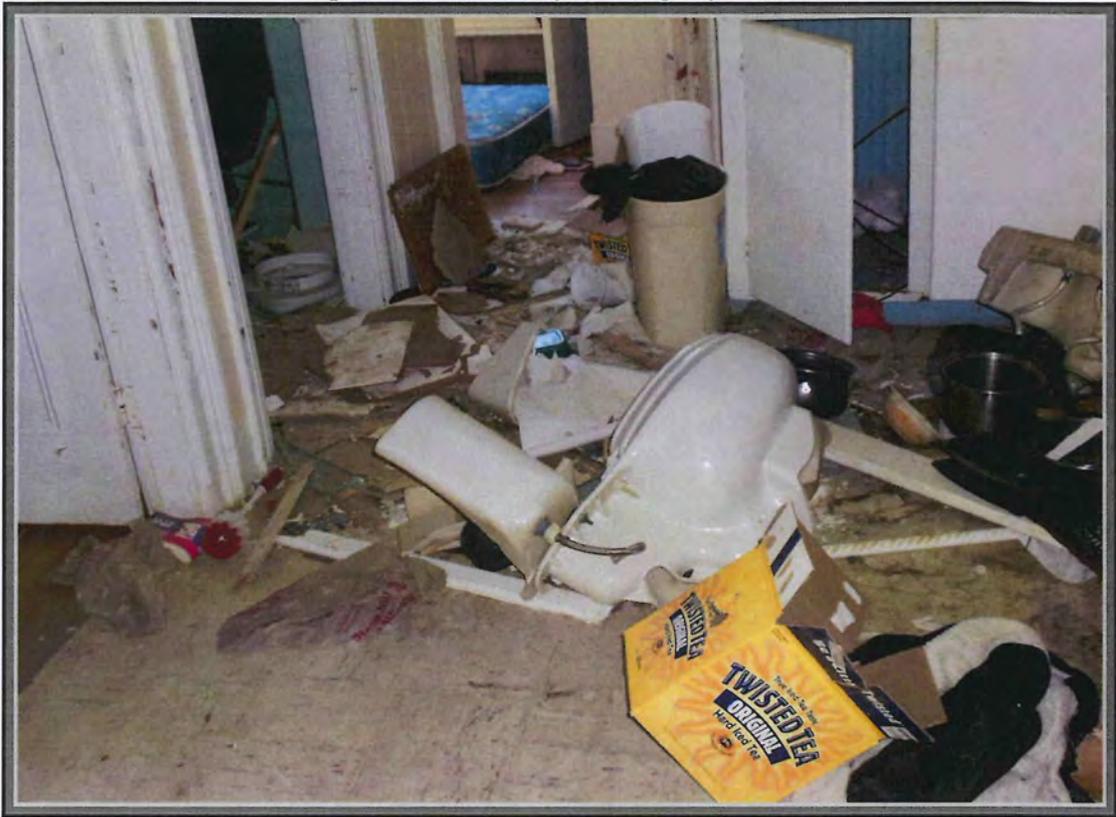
Damage from copper removal leaving structurally unsafe conditions and the removal of a toilet leaving an unsanitary and open sewage drainage system.
